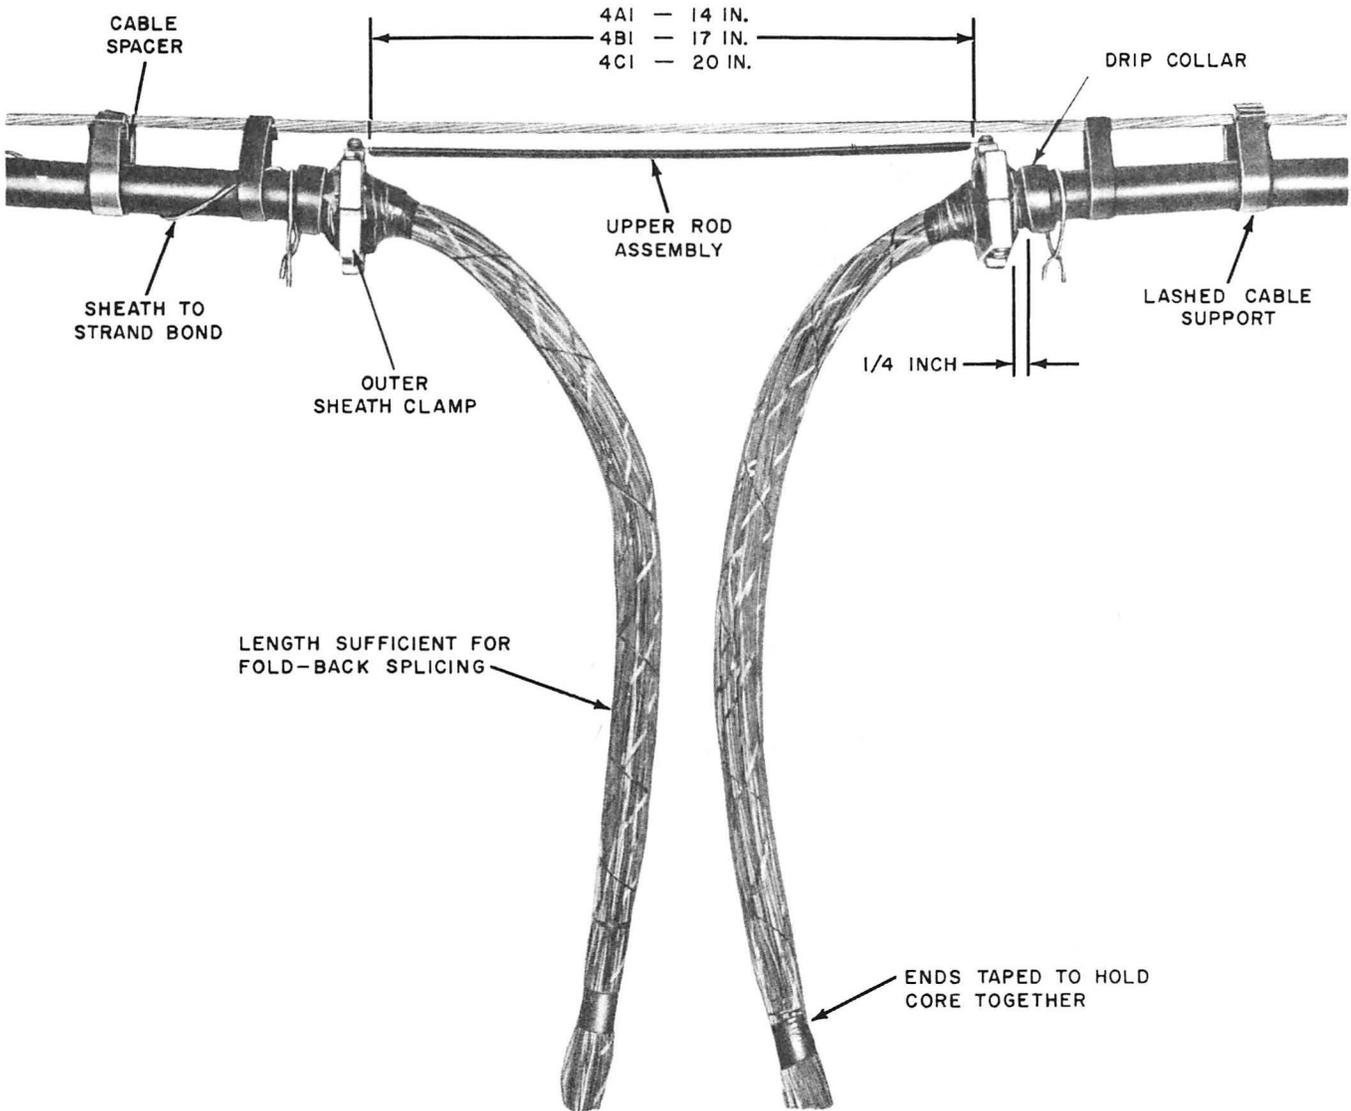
Outer Sheath Clamps and Upper Rod Assembly Installed
